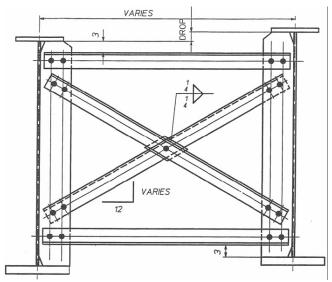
Example of Steel "X" Shaped Cross Frame [12]
